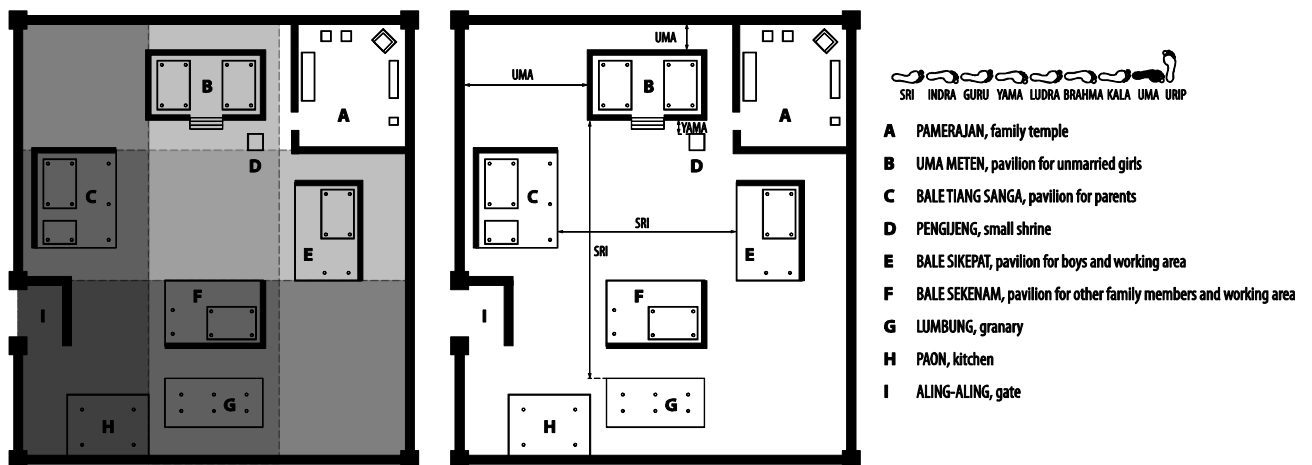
Layout of a typical house compound. Left: shading according to the orienting axes mountain - sea and sunrise – sunset
